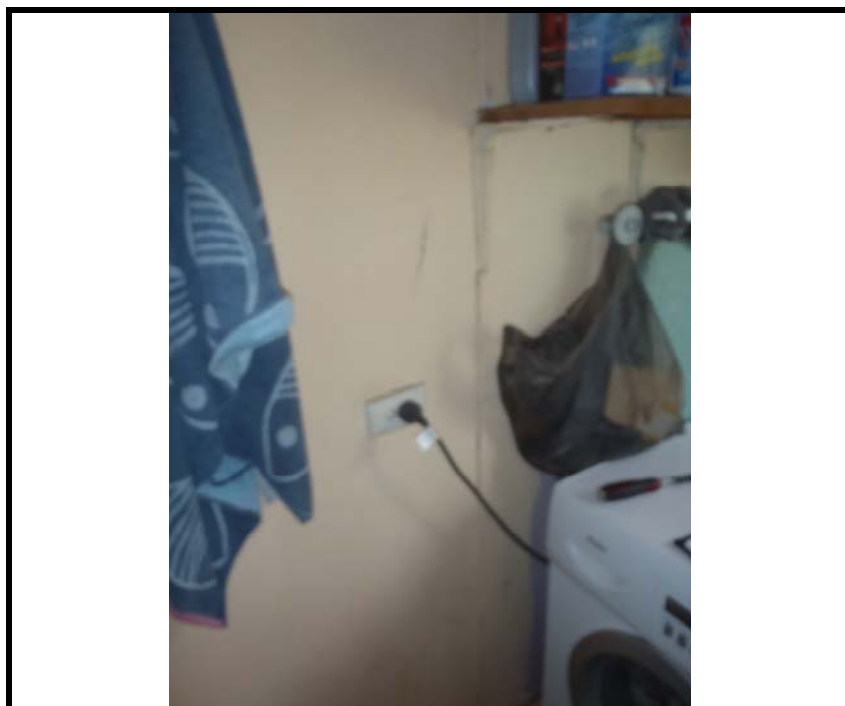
ACM sheeting used in the walls to the laundry at 1 McLeod Road
